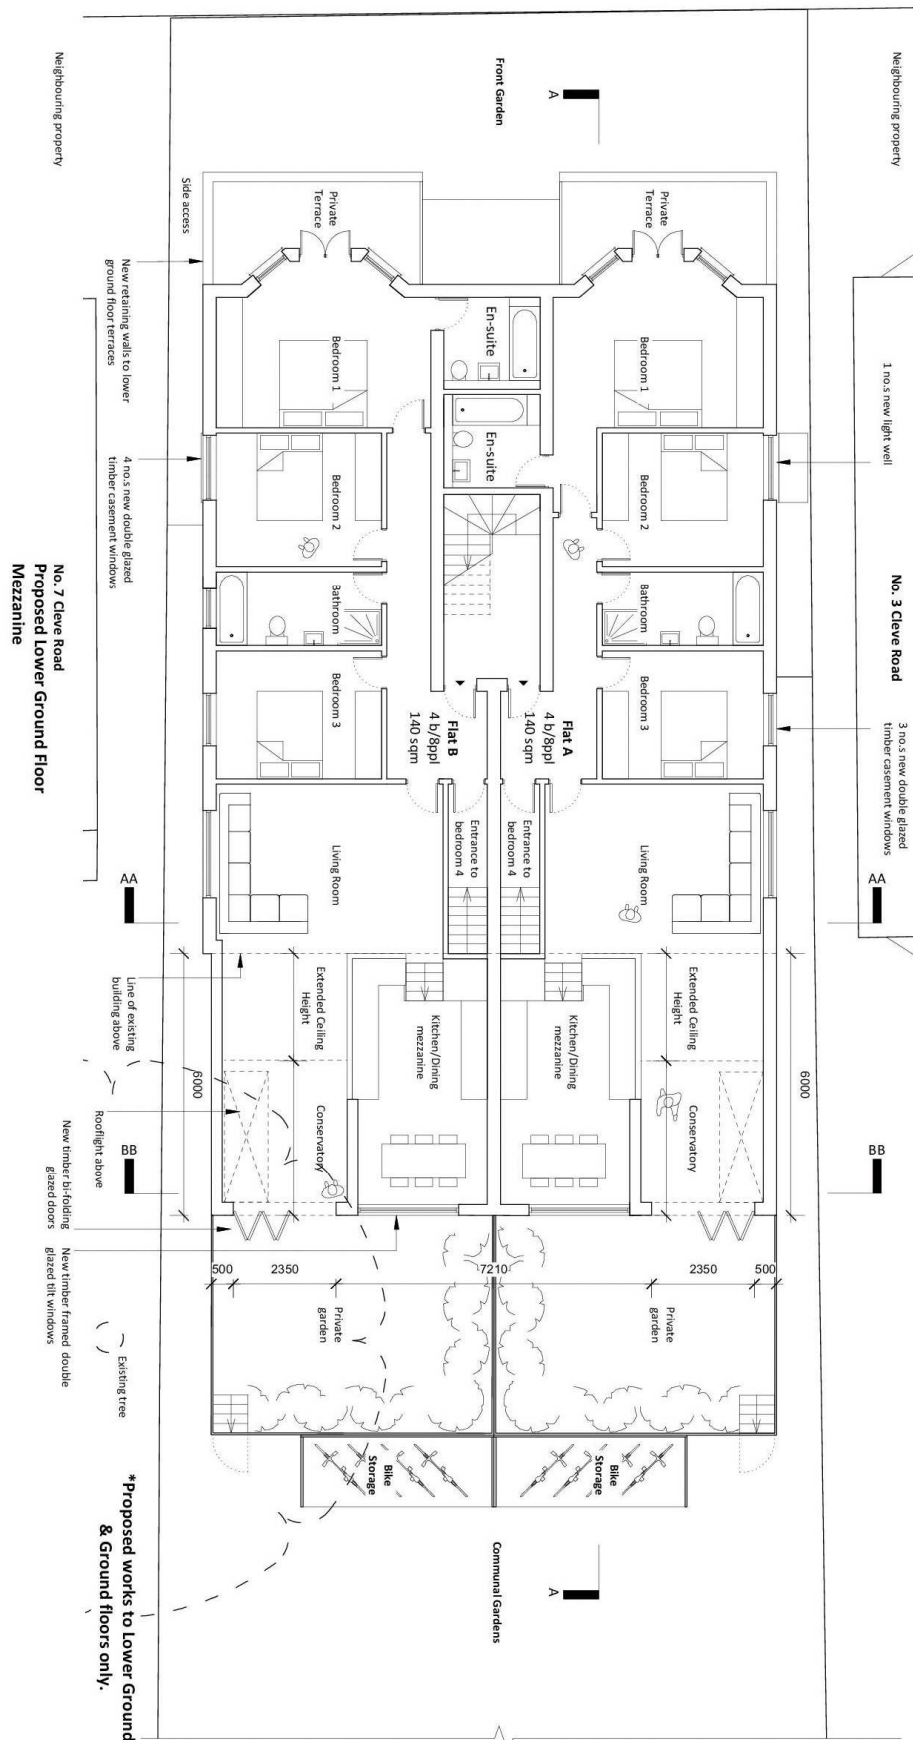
The proposed new works extend the lower ground floor to the rear of the building. The new basement area is below the two central 'kitchen / dining mezzanines' and so is away from the flank walls.
